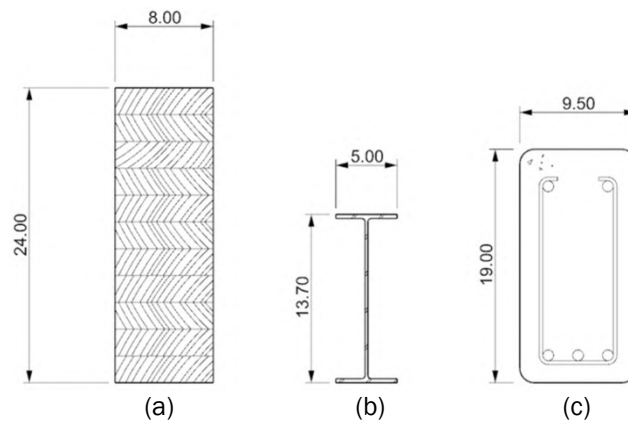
Equivalent cross-section to support the same load in (a) mass timber, (b) steel, and (c) reinforced concrete (Fang et al. In preparation)
